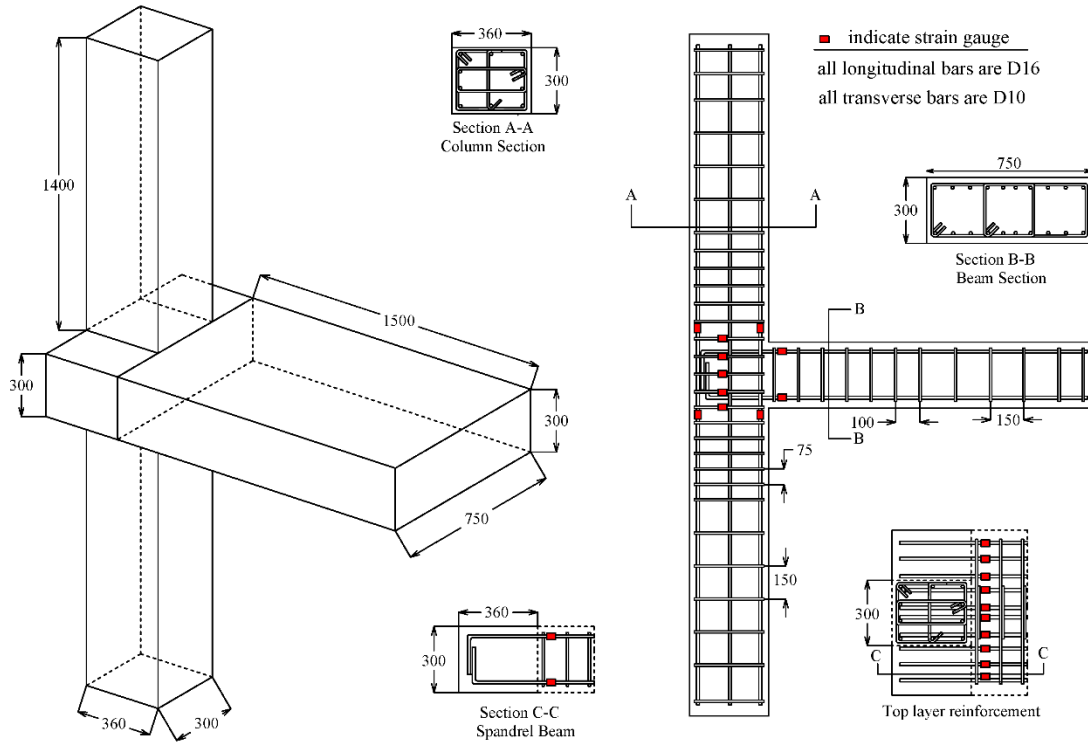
Dimensions and reinforcement details of specimen S5 (unit: mm).
